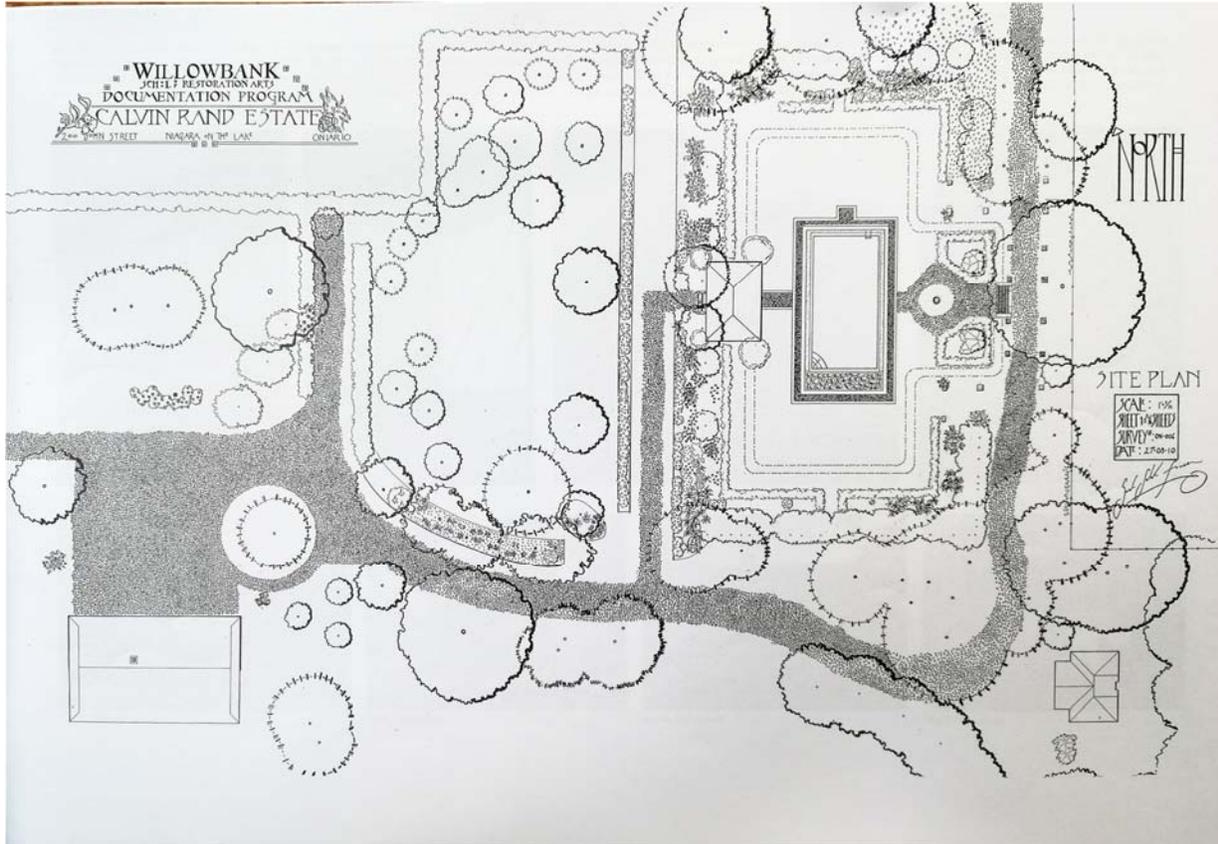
Drawing of site plan of tea house and pool, bathhouse (bottom left) and carriage house (bottom right) (Willowbank, 2010).
